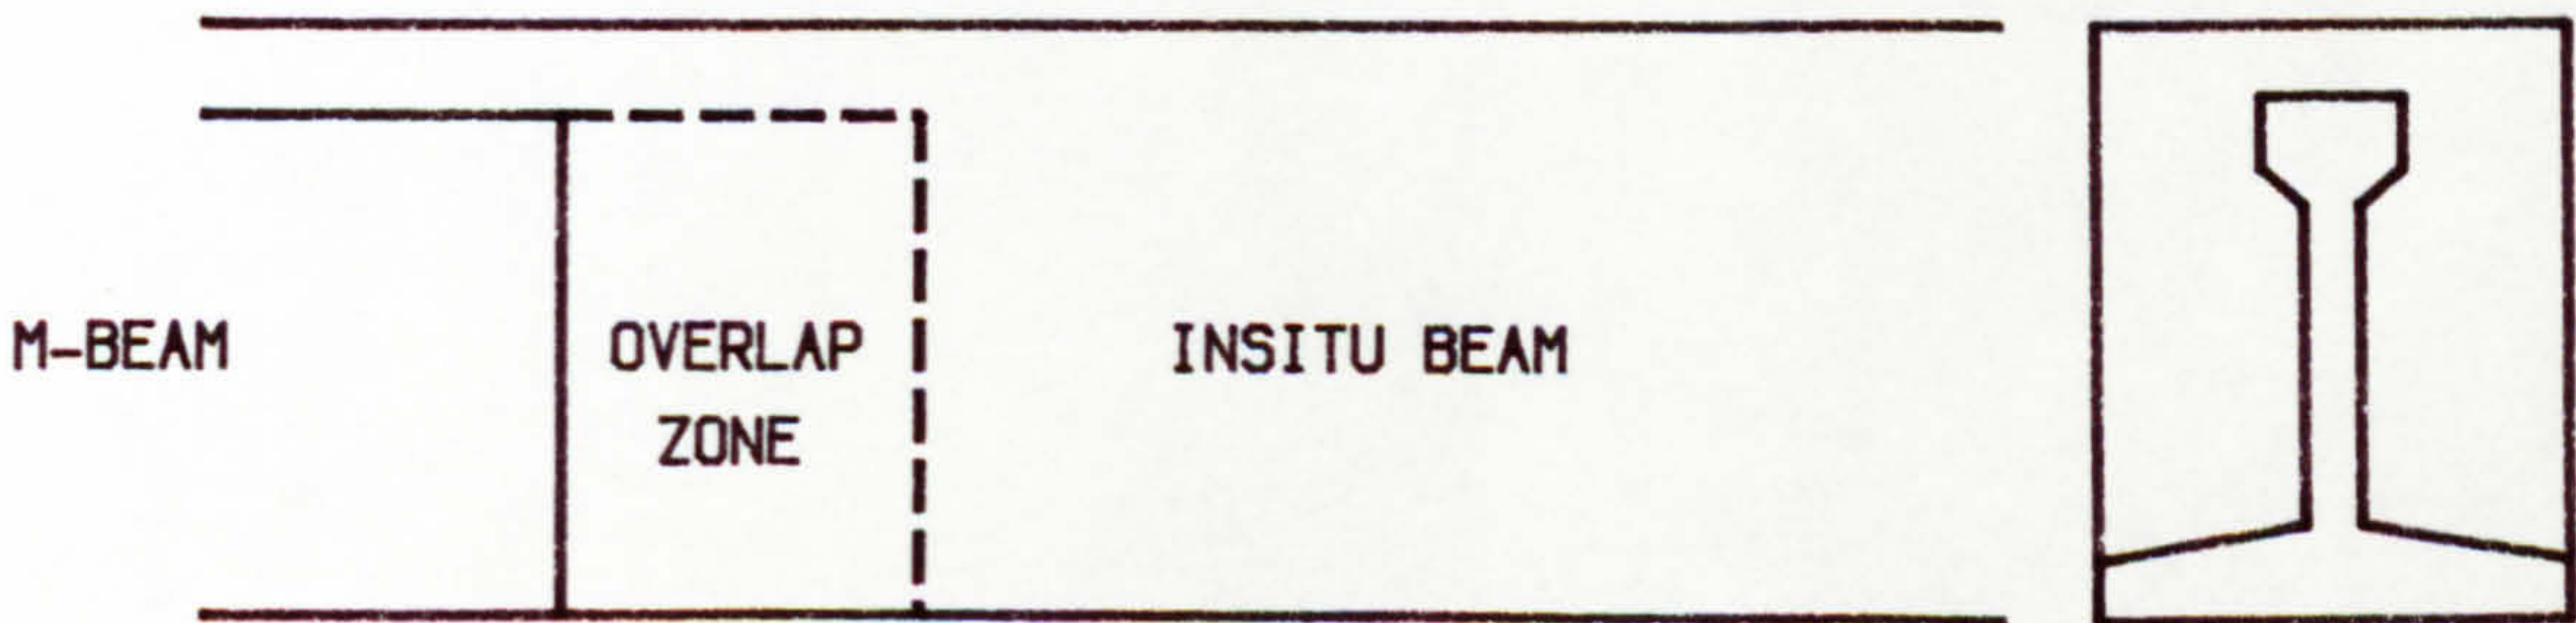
VERTICAL SEPARATION BETWEEN PRECAST BEAM AND IN-SITU NIB
